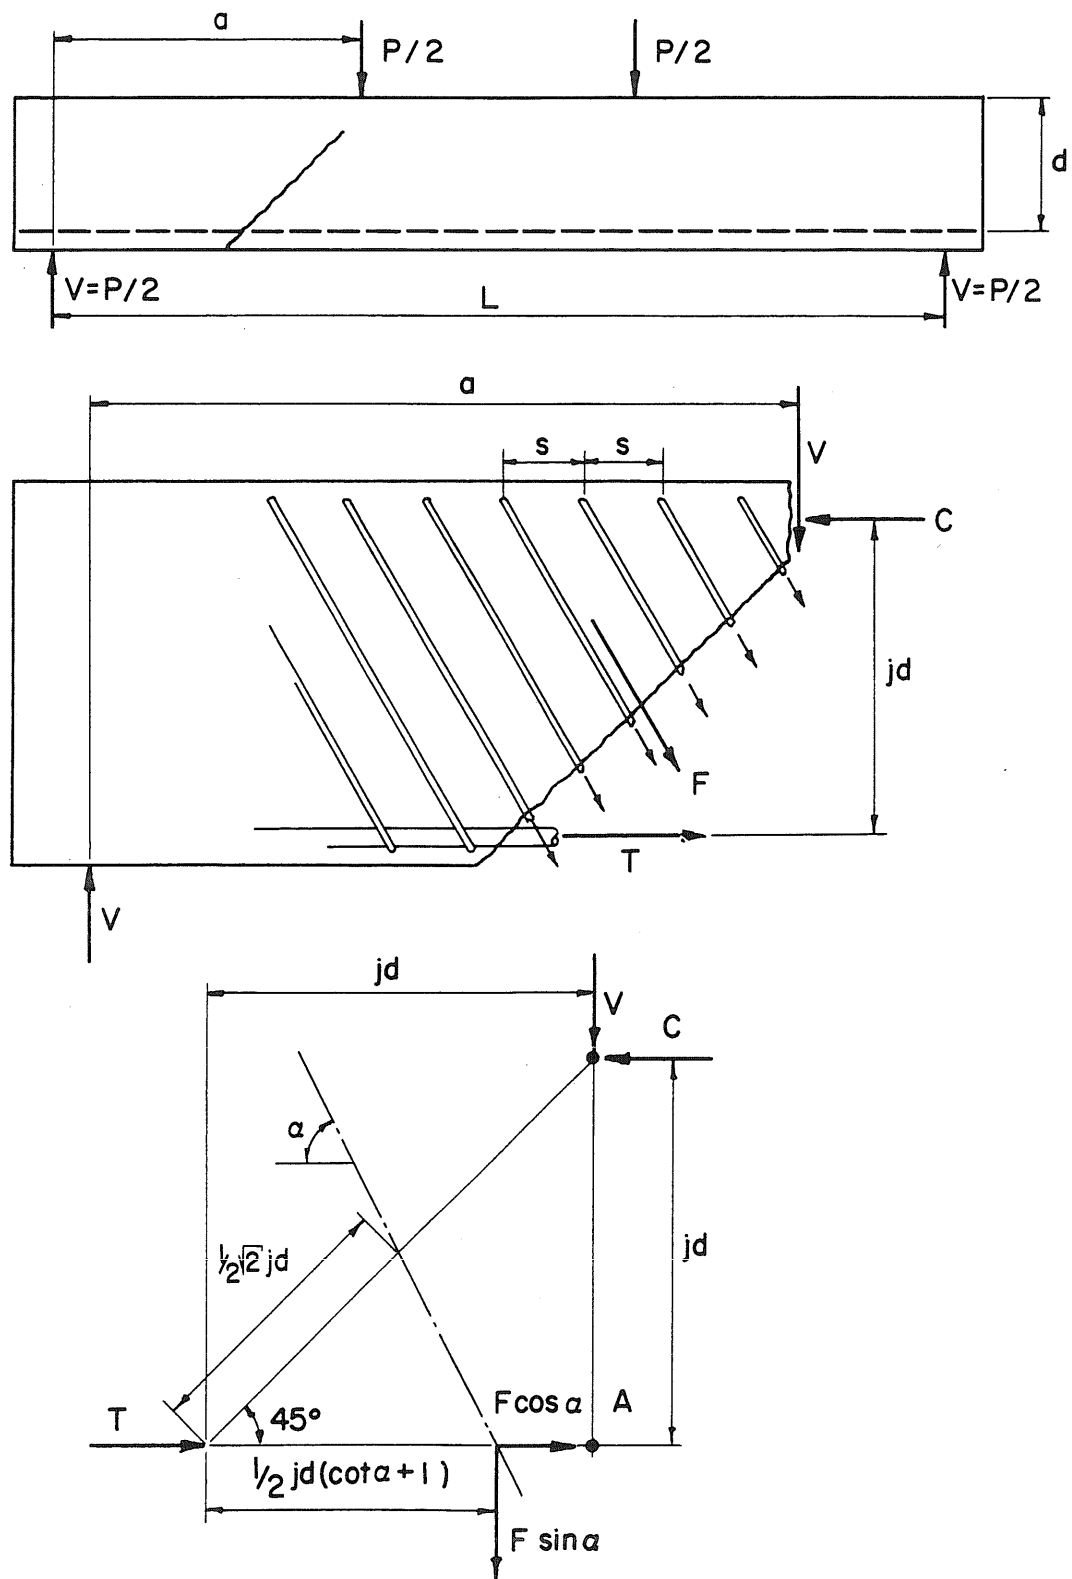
INTERNAL FORCES AT SECTION OF DIAGONAL CRACK
